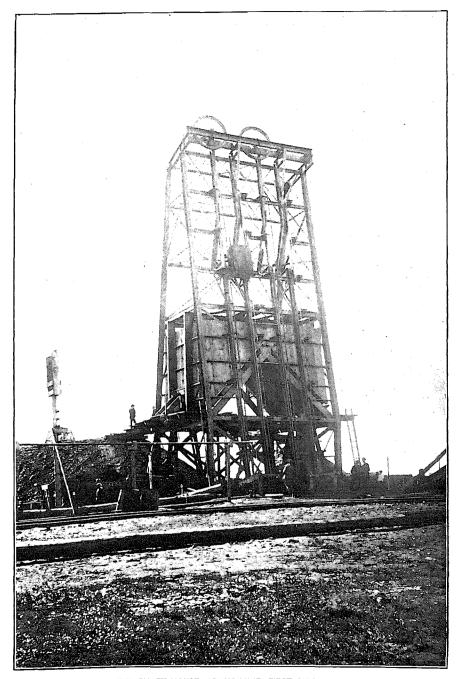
PLATE IV.-STEEL SHAFT HOUSE, ADAMS MINE, FIRST ON THE MESABI RANGE.
